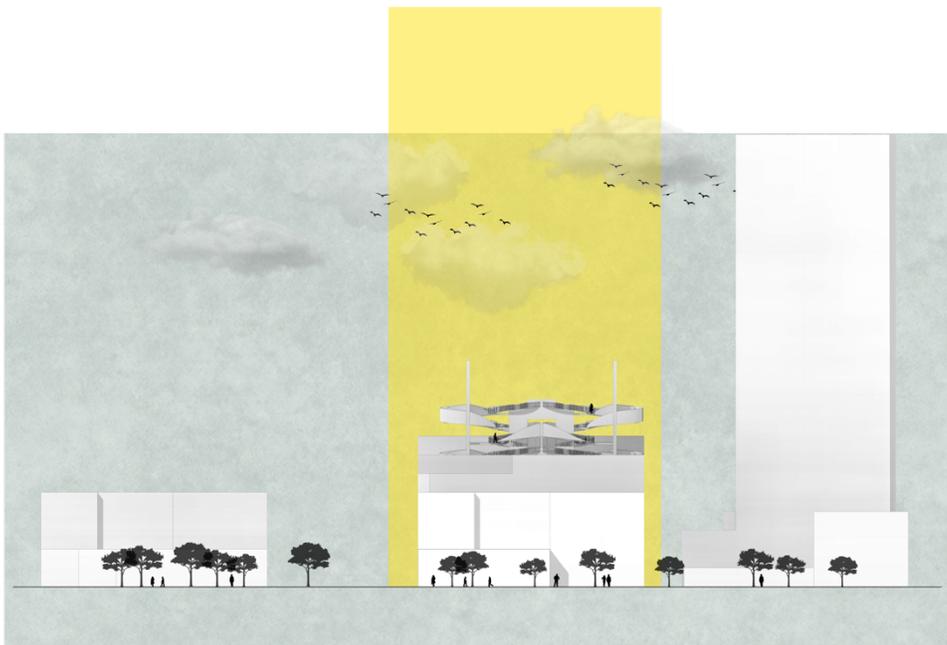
Side Elevation (Davie Street): transparency of the building and how it invites people on the street to check it out
